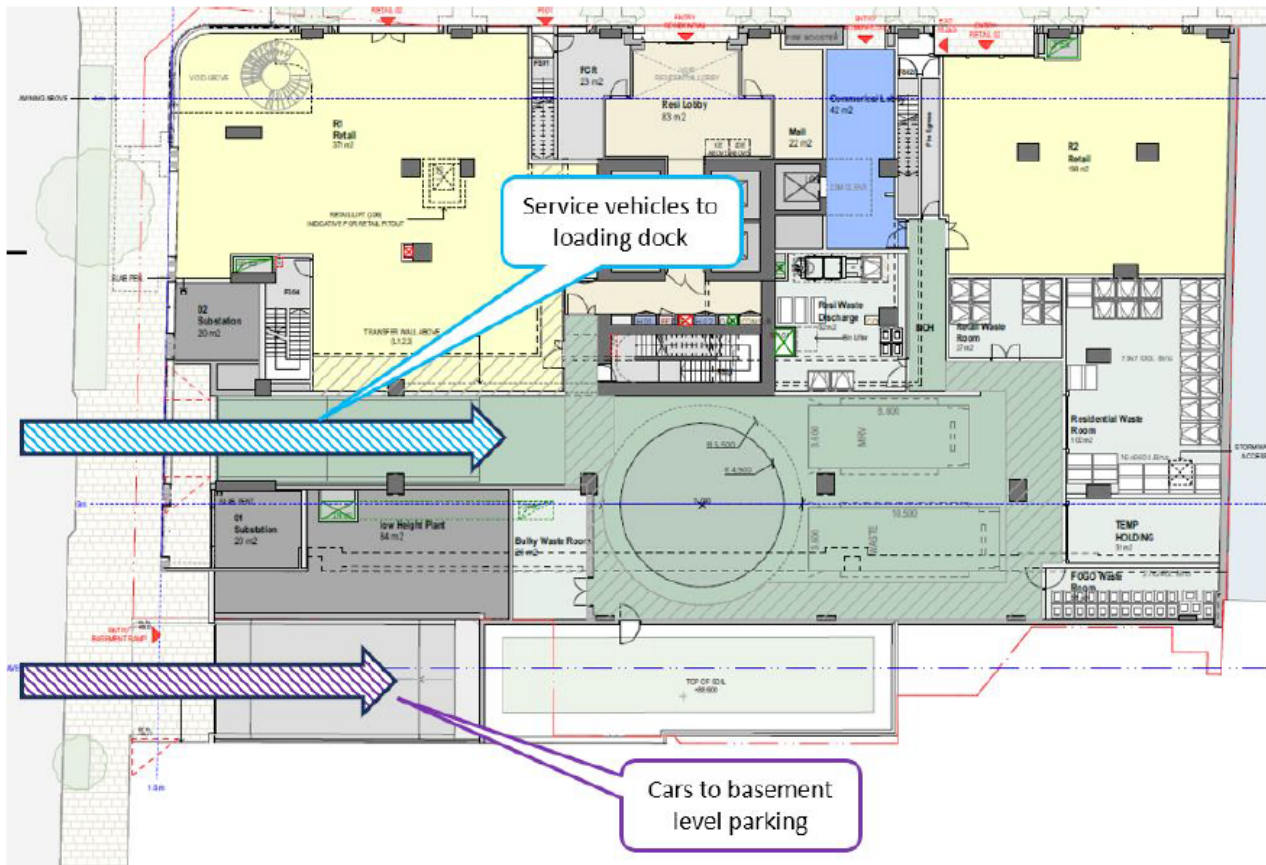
Proposed site access arrangements (Source: JMT Consulting 2026)
